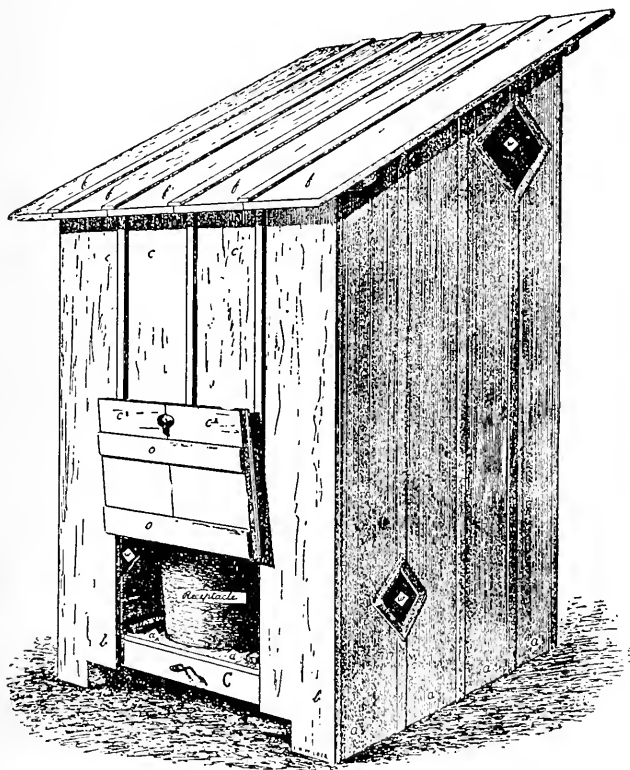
Rear and side view of privy shown in Fig. 42. (After Stiles.)
